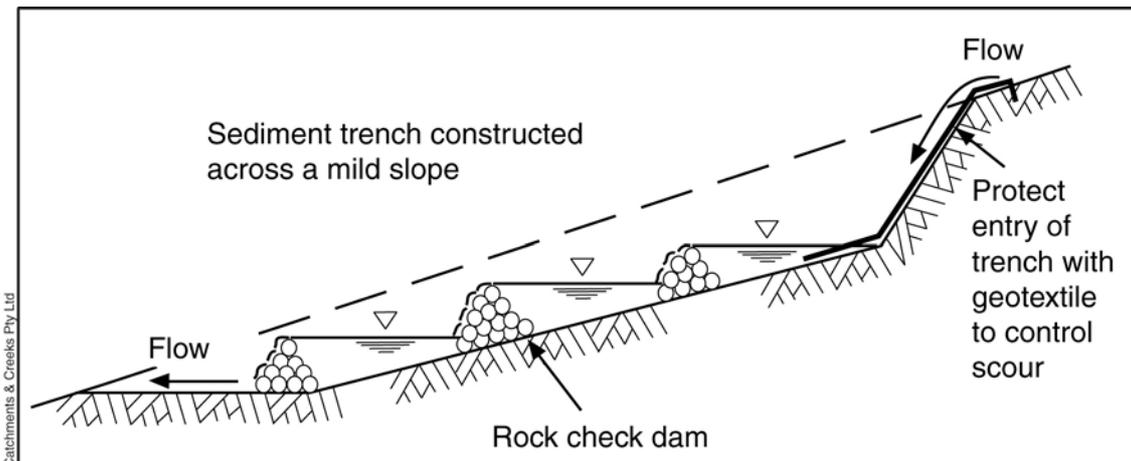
Long-section of a sediment trench excavated diagonal to a slope
